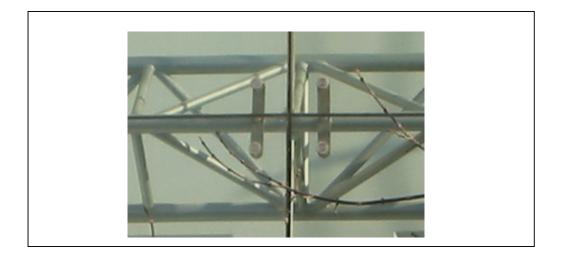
3D space framed horizontal truss. Source: By author, 2003
